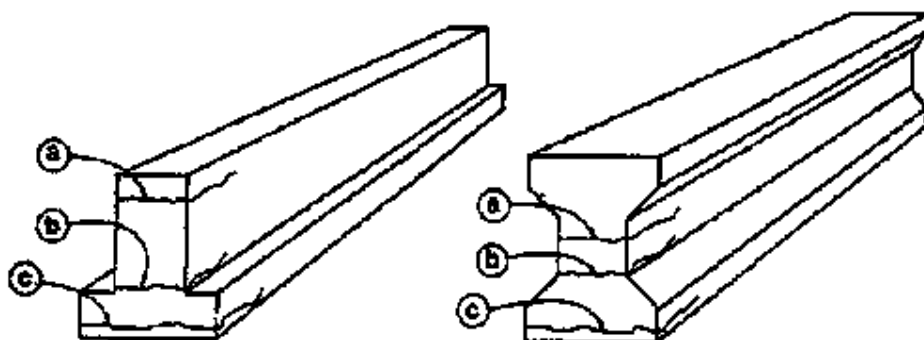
Cracks in pretensioned concrete beams
